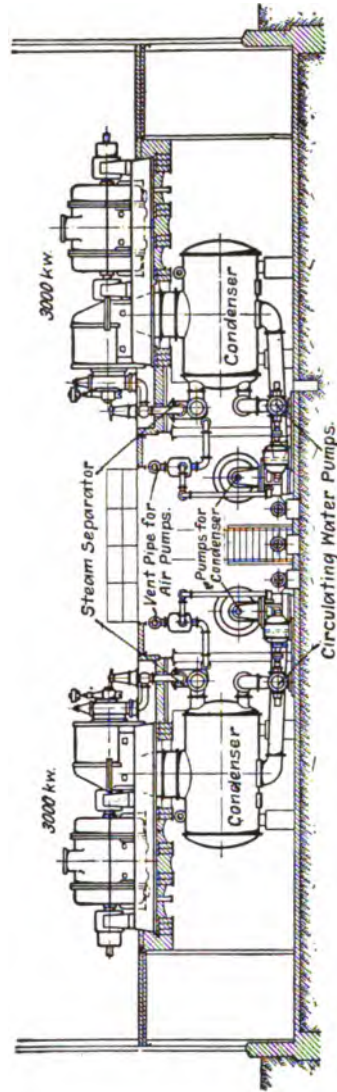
Brakpan Power Station. Condenser Plant. Longitudinal Section. Scale, 1 to 250.
